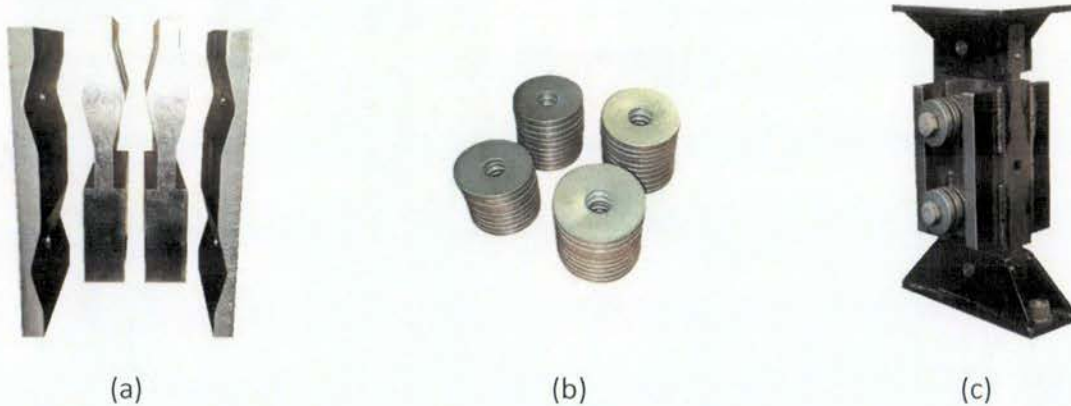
The tested RSF hold-down: a) Cap plates and centre slotted plates b) Belleville washers c) Assembly
